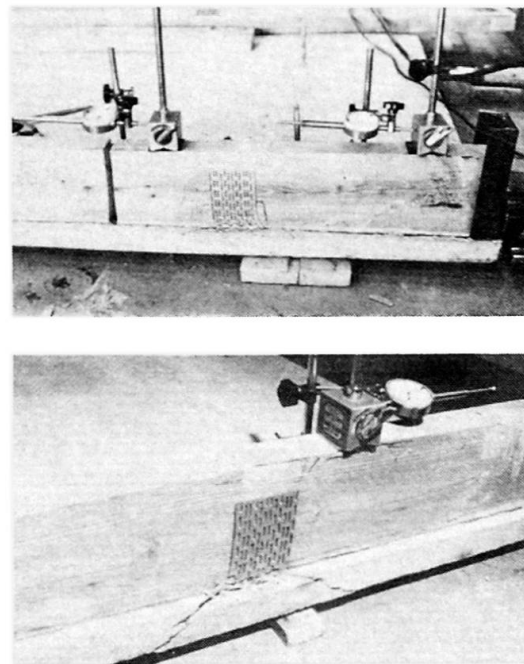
Failure modes in shear in the nail-plates and cracking of the concrete edge, respectively, in the case of inner tests
